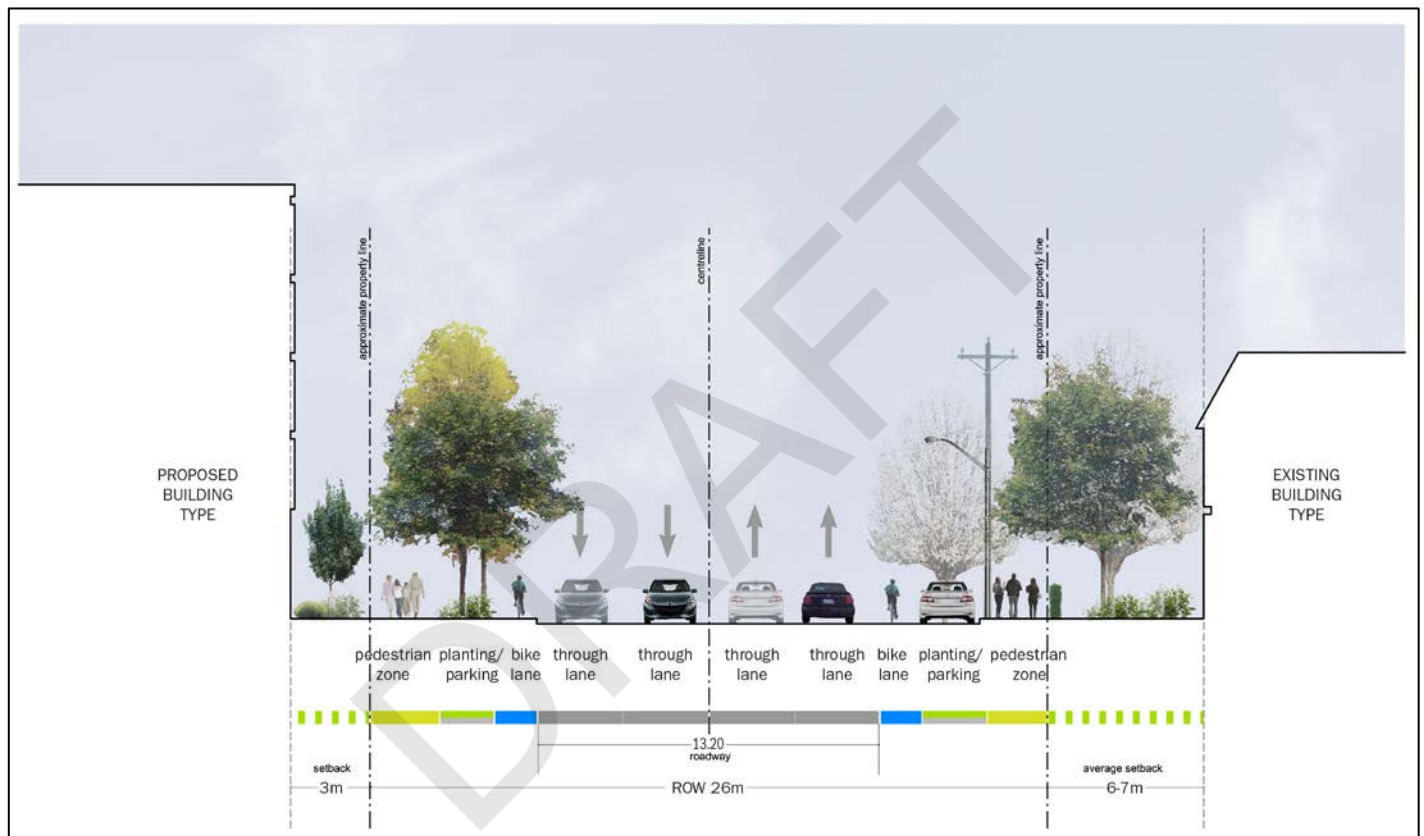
Typical mid-block cross-section at Brock Street South (UDG Section 5, Figure 5.20).
